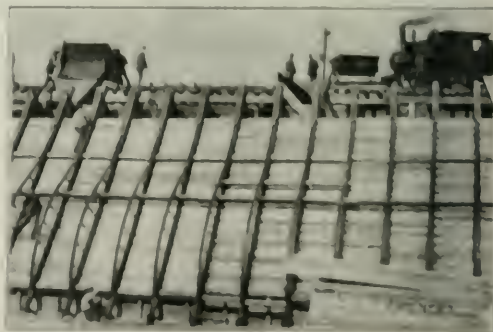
CONCRETING THE SPILLWAY SECTION OF THE GENES RAPIDS DAM
